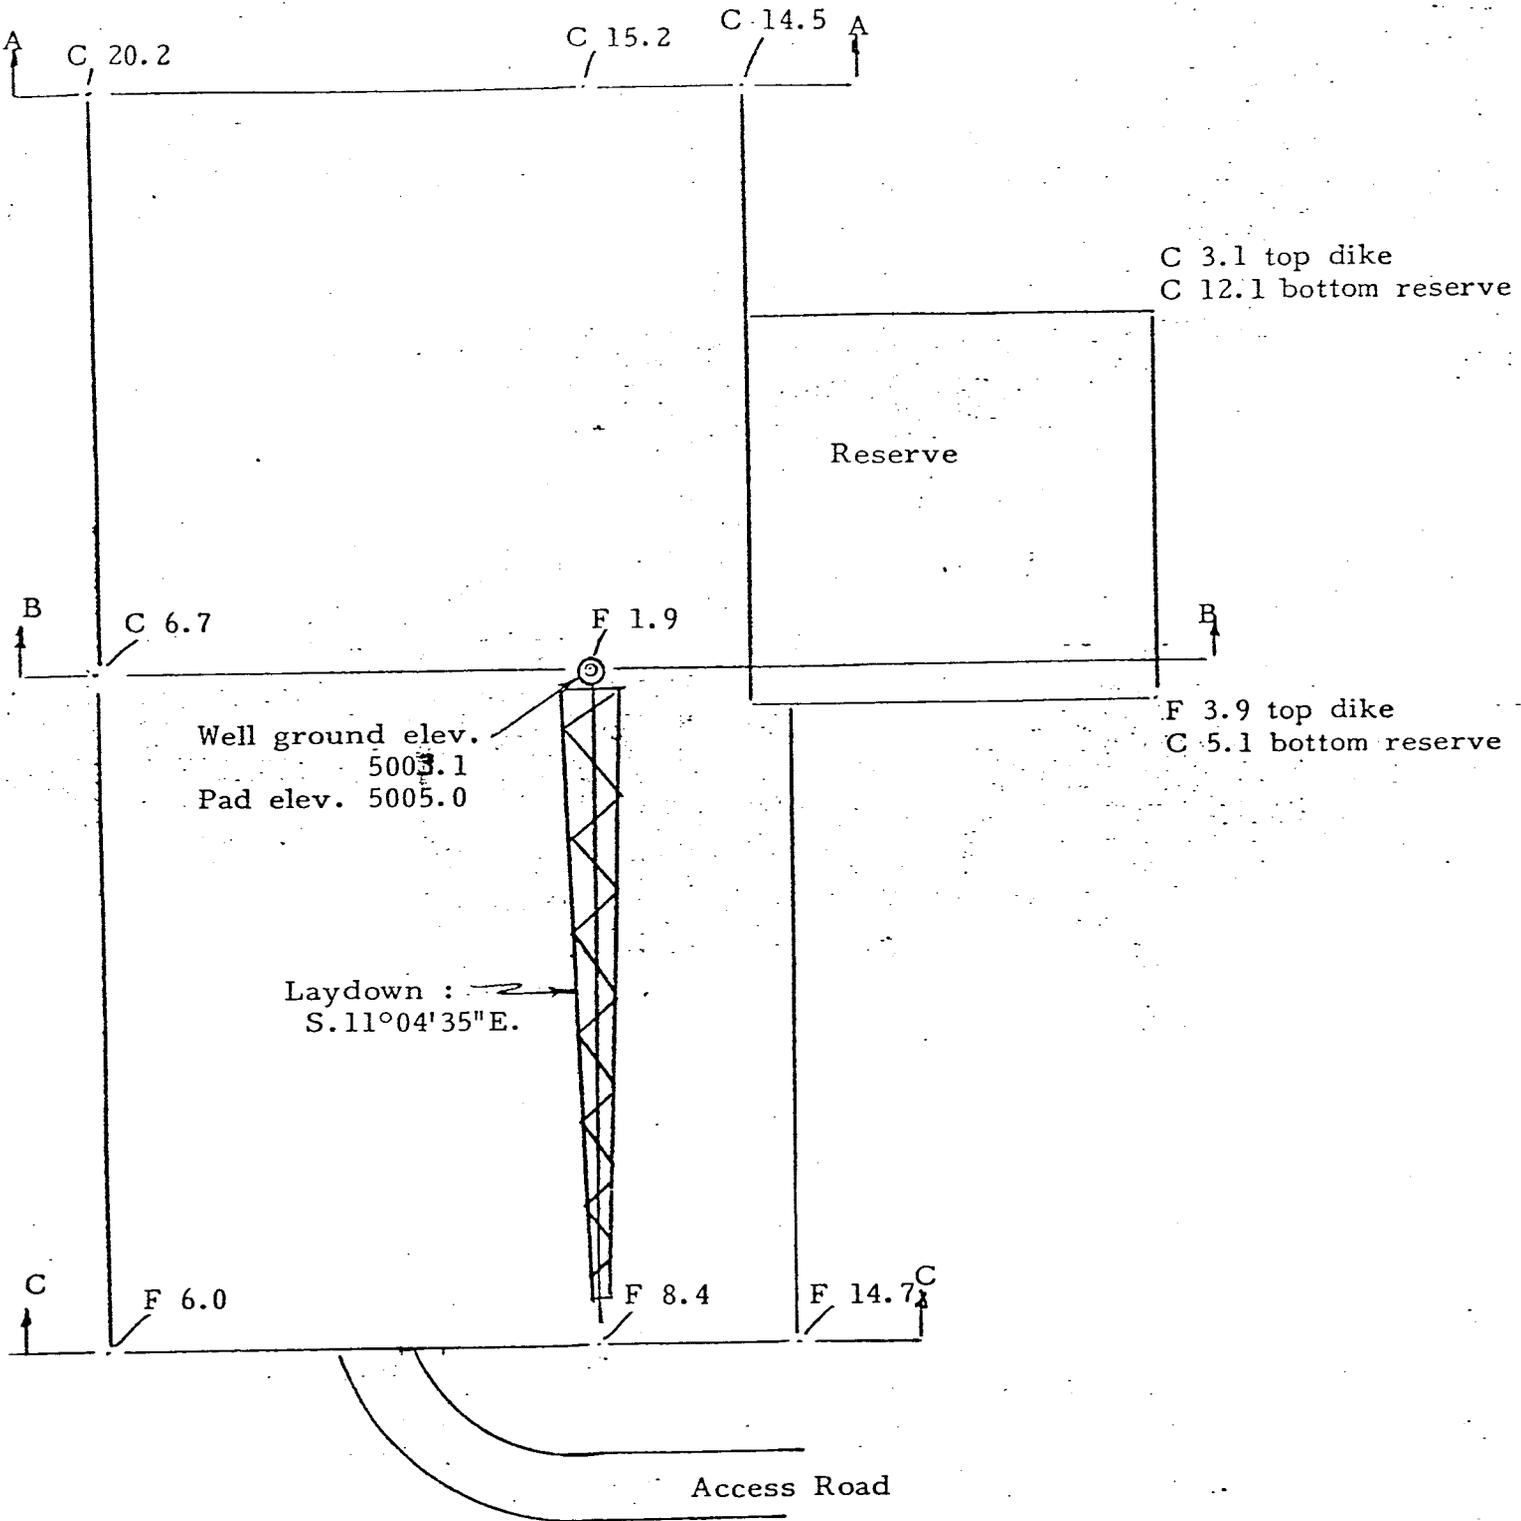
EXHIBIT E - WELL PAD FACILITIES AND ELEVATIONS
